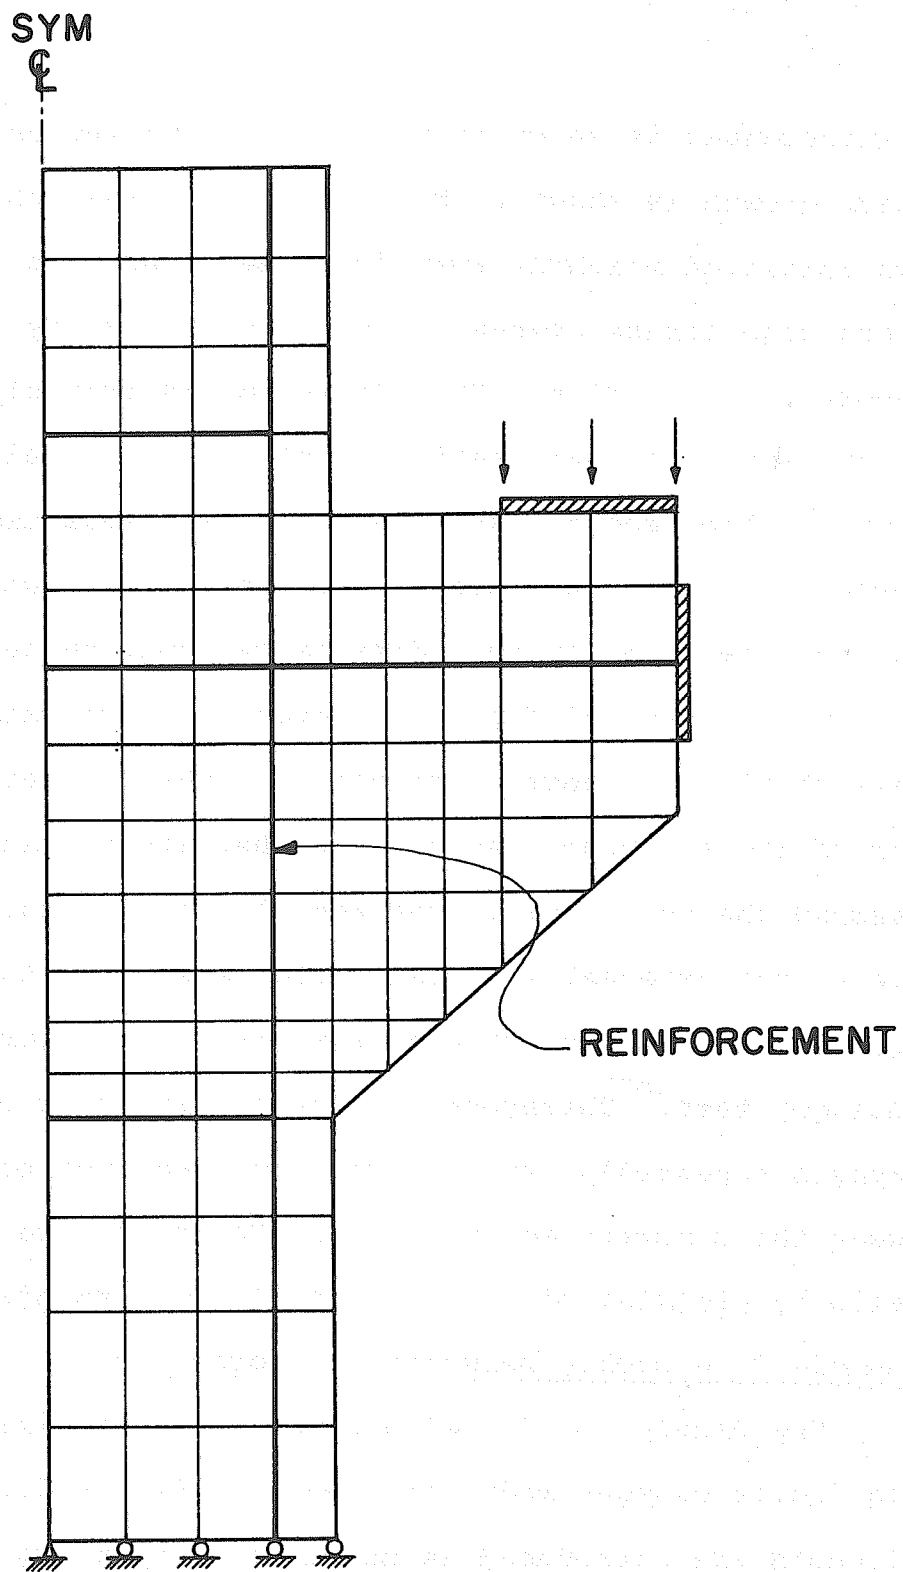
EXAMPLE B - A CONCRETE BRACKET
